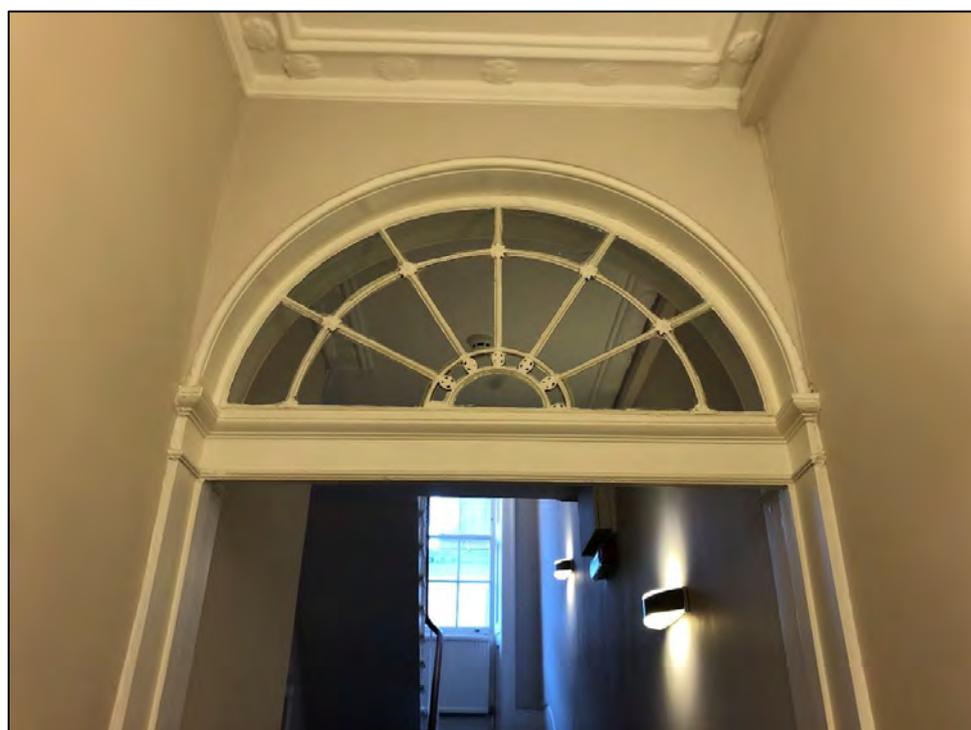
View looking W showing detail of glazed overlight in the entrance hall
